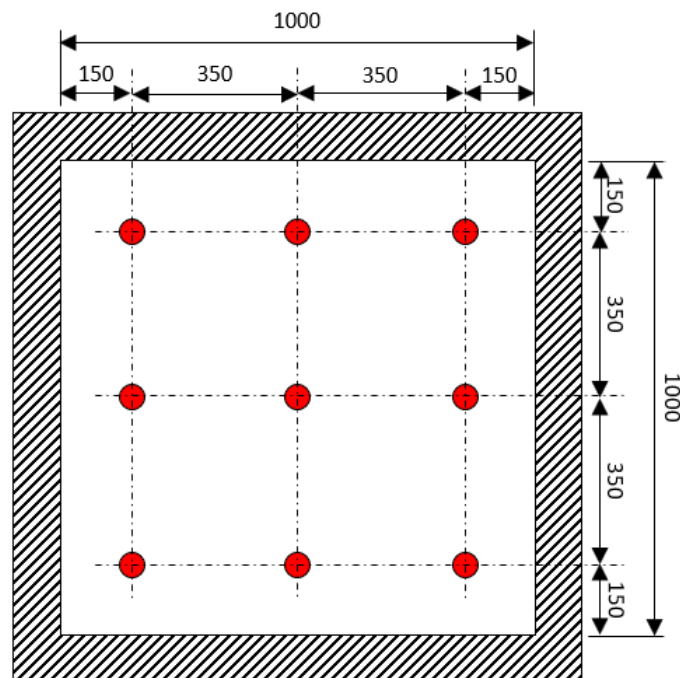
Placement of thermocouples on the specimen surface. Section view.
